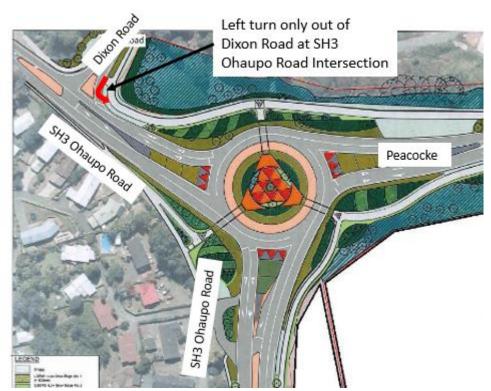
New Roundabout on Ohaupo Road and proposed right turn ban out of Dixon Road
